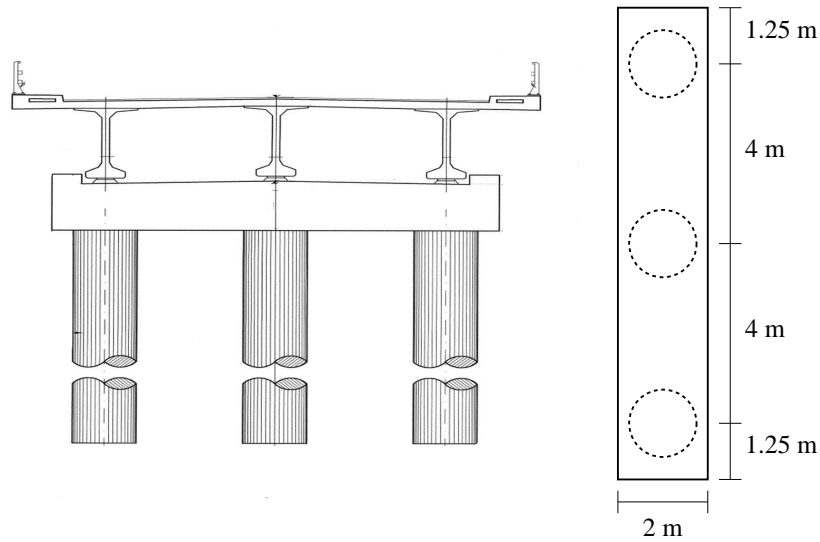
Elevation and plan views of typical interior pier shaft cap for Puente Mataquito (courtesy Ministerio de Obras Públicas, Chile).
